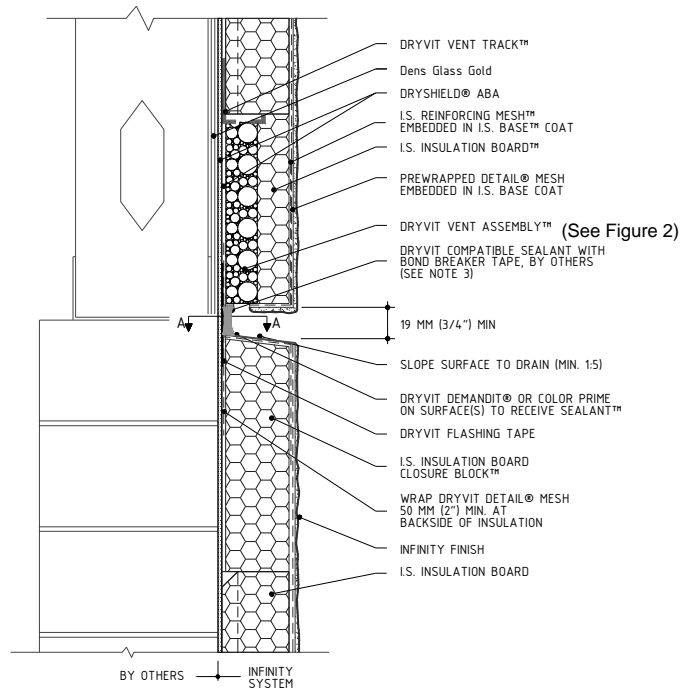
TYPICAL INSTALLATION DETAILS—(Continued)
